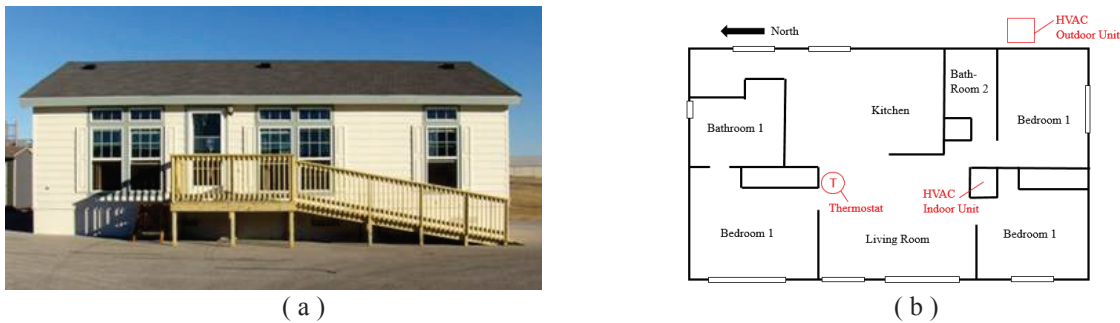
Single family manufactured home laboratory facility (a) exterior and (b) schematic diagram of interior space of facility include the location of the indoor and outdoor units of the HVAC and the thermostat.
